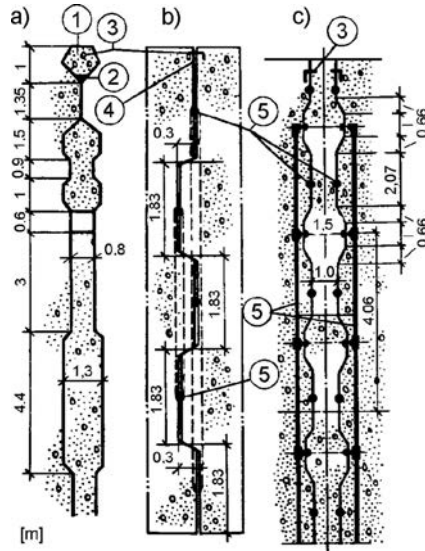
Structural joints for arch dams. (1) Reinforced concrete dowel; (2) bituminous sealing compound; (3) metal waterstop; (4) asphalt filling; (5) grouting pipes.
